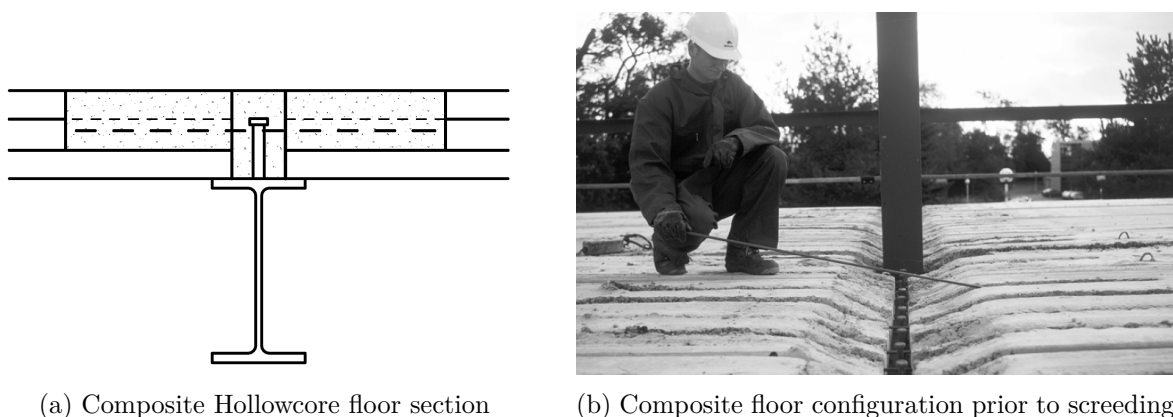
Composite floor construction with precast hollowcore units and steel beams (Hicks and Lawson, 2003)
